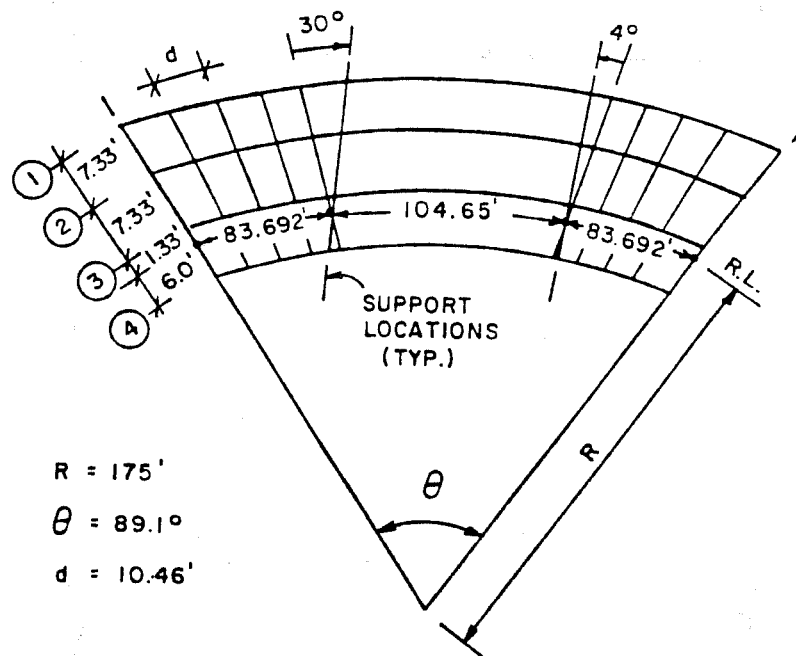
Plan view of bridge unit with skewed interior supports.
